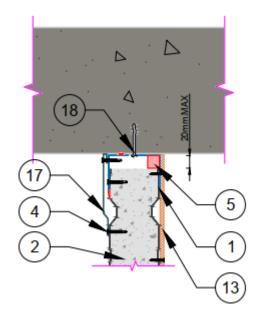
Dual wall system with vertical wall between horizontal walls – horizontal head detail – option 01
